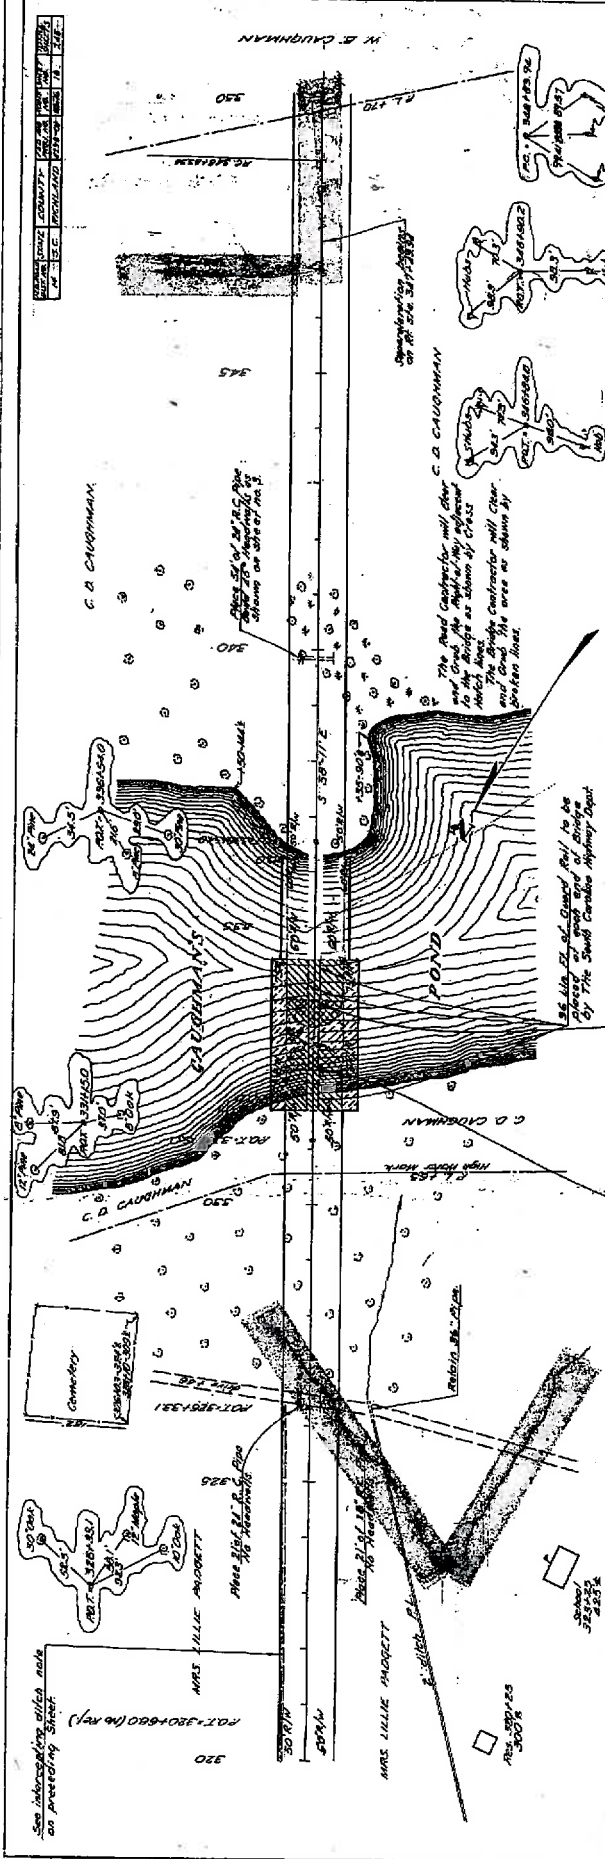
PLAN - PROFILE AND ELEVATION
